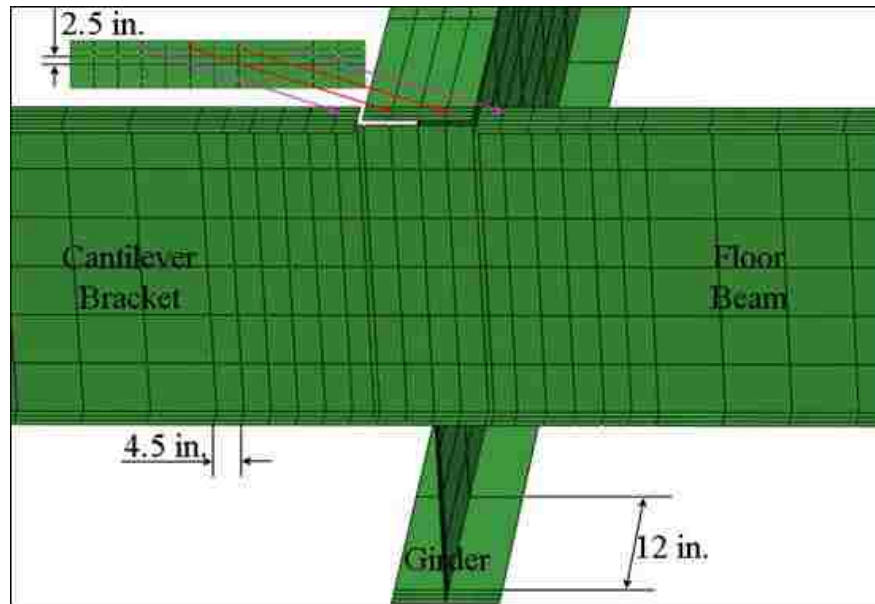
Detailed mesh and constraint at floor beam-girder connection
